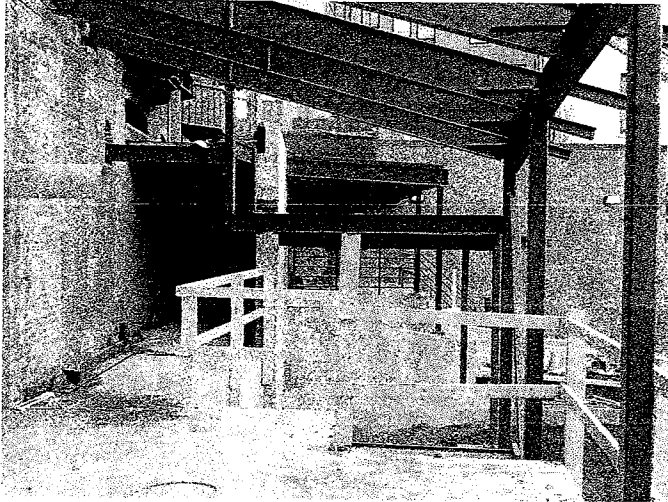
Structural Steel at Back Entrance (installation in progress)
